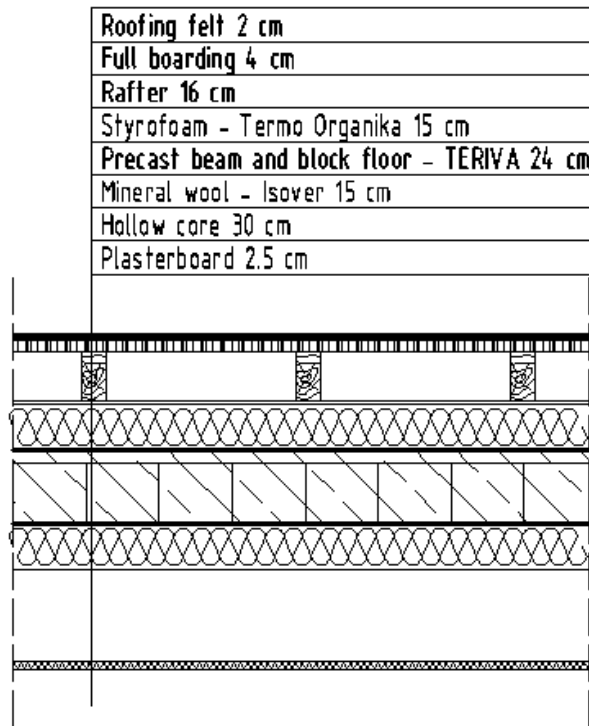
Structure of the roof cross section 2-2.
